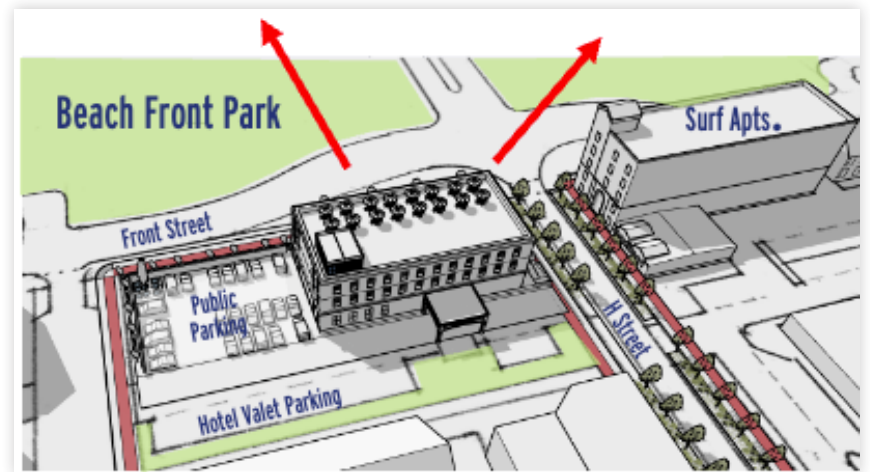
Anchor Development- Front and H Street Boutique Hotel Views Looking South
